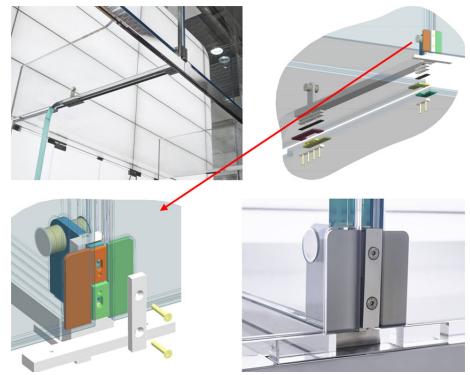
Glass fin with Z-shape with laminated inserts to connect the roof and façade glazing.
